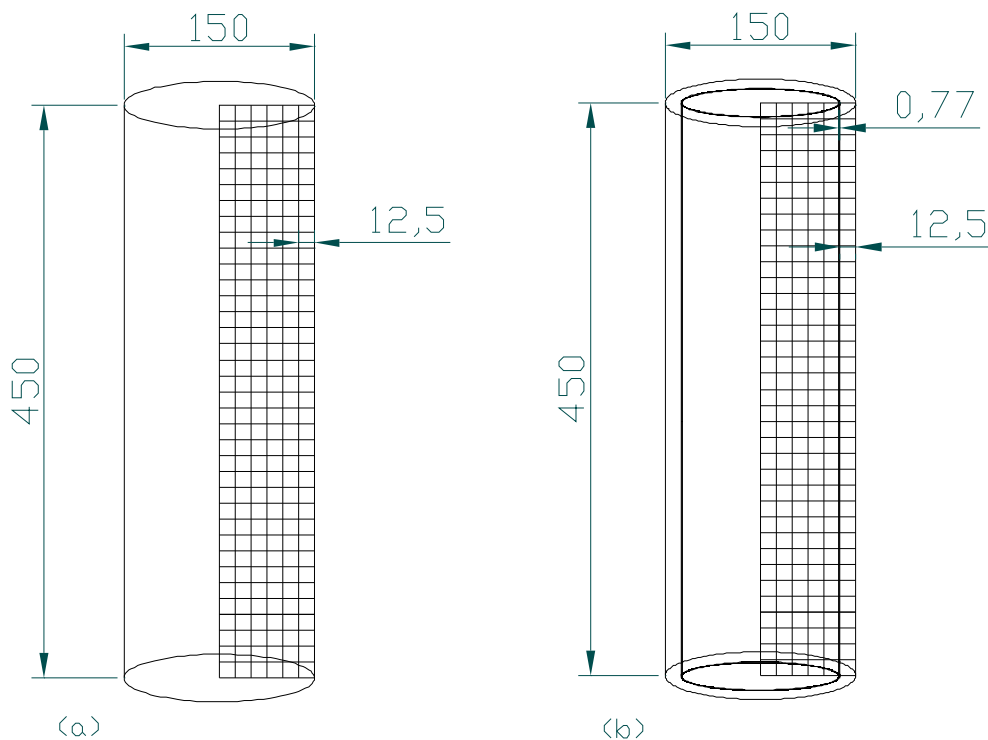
Diagram of the concrete cylinders tested, dimensions given in mm, and the FE mesh used to model them showing (a) the plain concrete cylinder, and (b) the reinforced concrete cylinder
